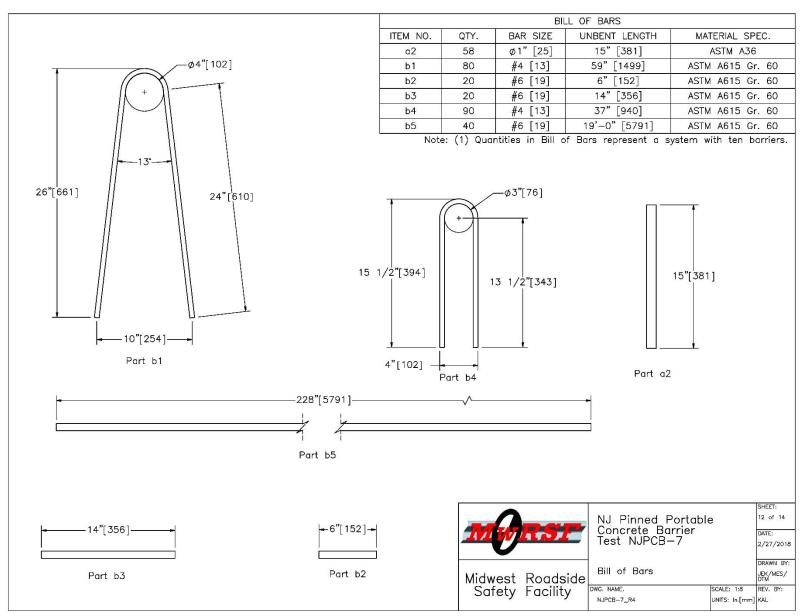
PCB Reinforcement Details, Test No. NJPCB-7
